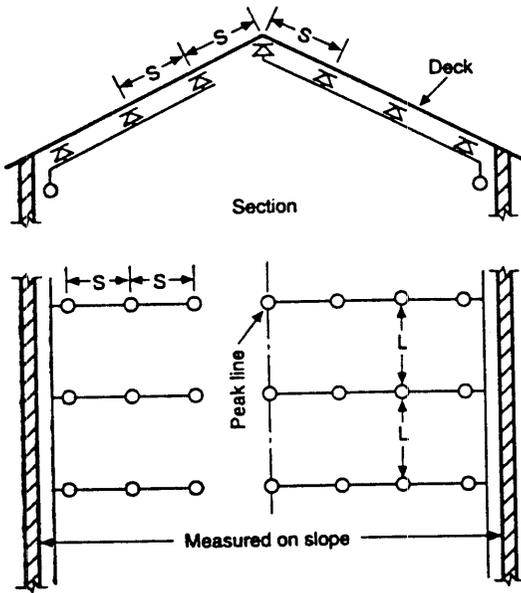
(a) Sprinklers at pitched roofs; branch lines run up the slope.
